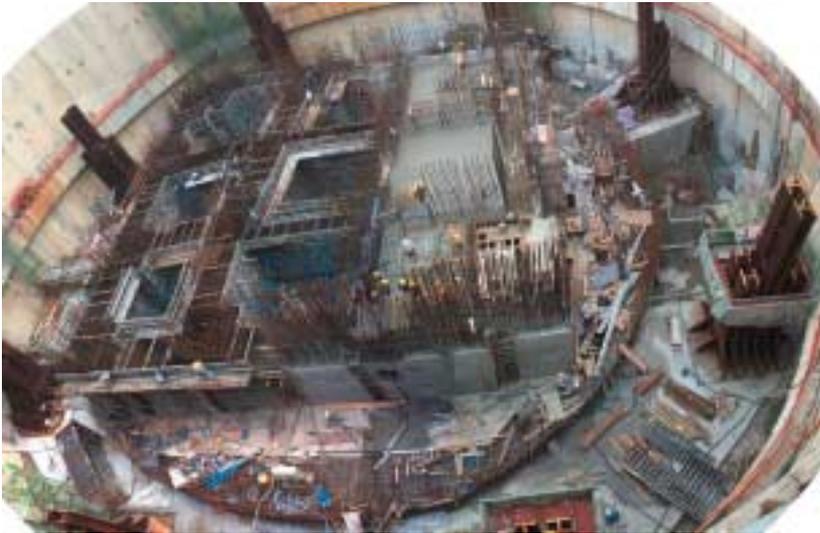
The core wall of the Two IFC tower ascending from the raft at the bottom of the cofferdam. Also note the mega-columns anchored to the plinths by gusset plates
